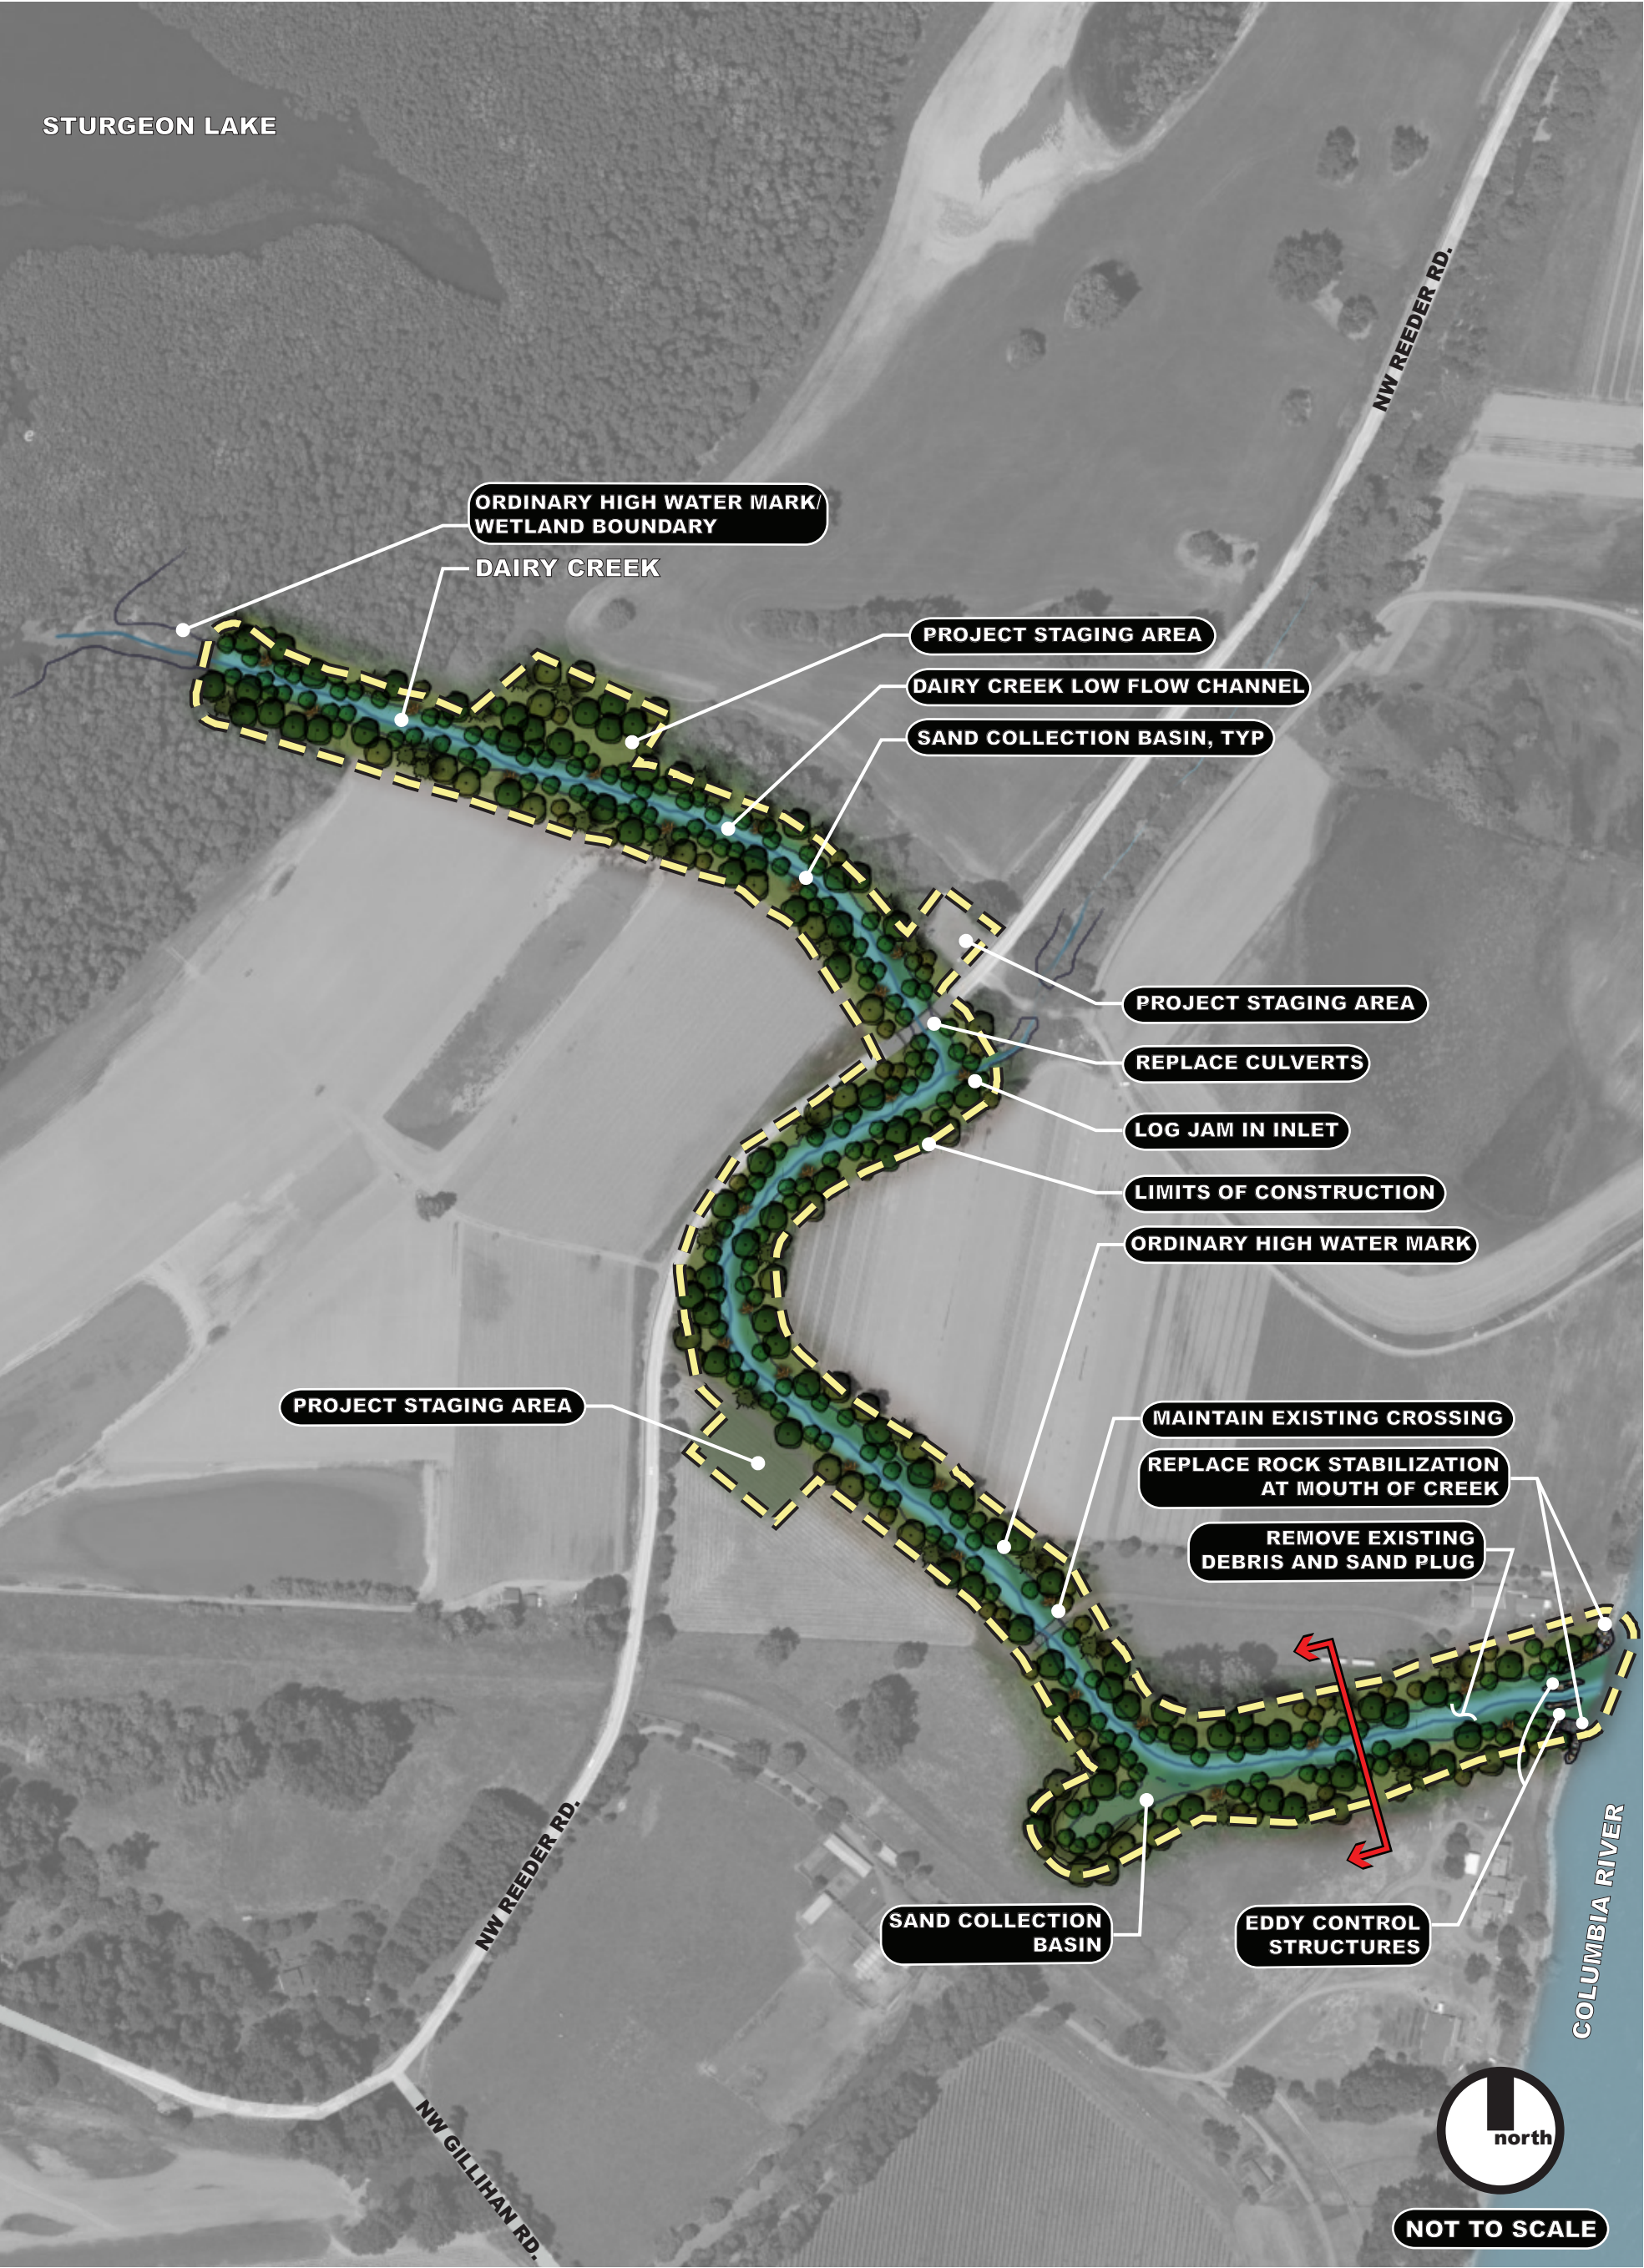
Plan View of Proposed Improvements at Dairy Creek
